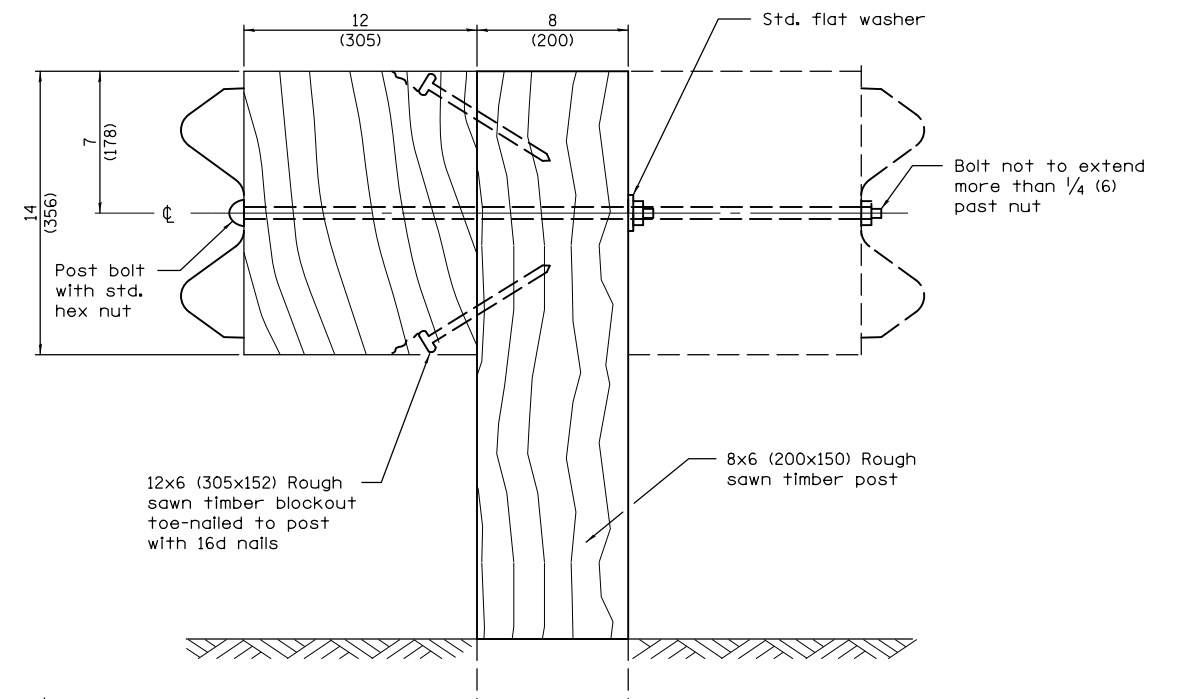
1/2" STEEL PLATE BEAM GUARDRAIL
